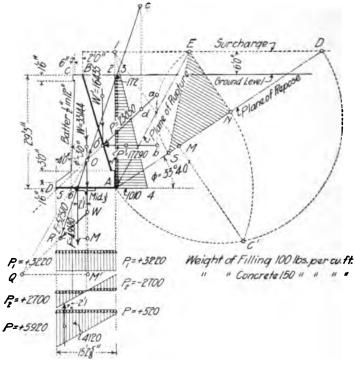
Retaining Wall, West Alameda Avenue Subway.
